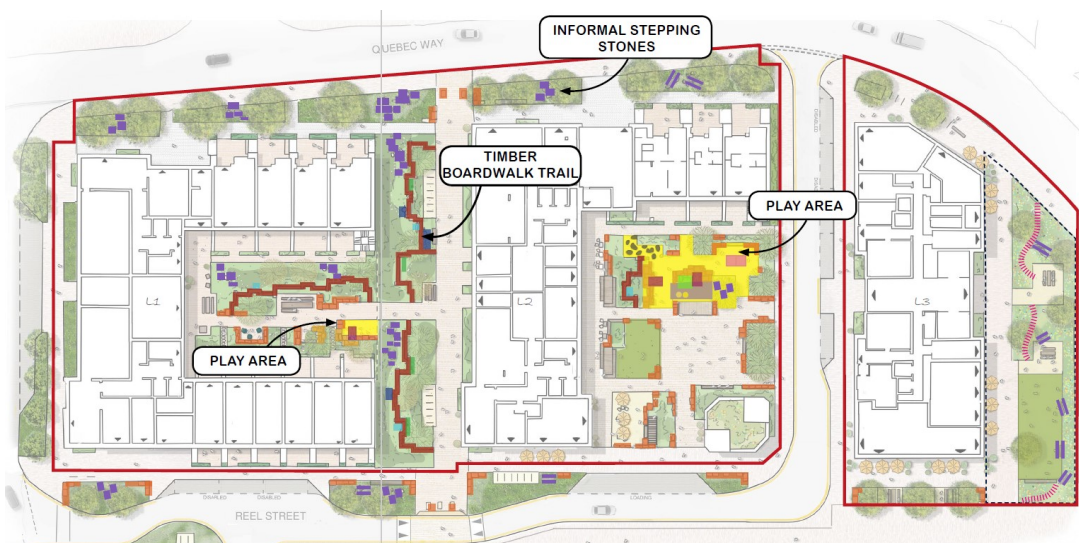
(above): Illustrative play space plan depicting the two formal areas of play, one at the L1 courtyard and one at the L2 square, supplemented by informal play areas weaved into Reel Walk and parts of Quebec Way.
